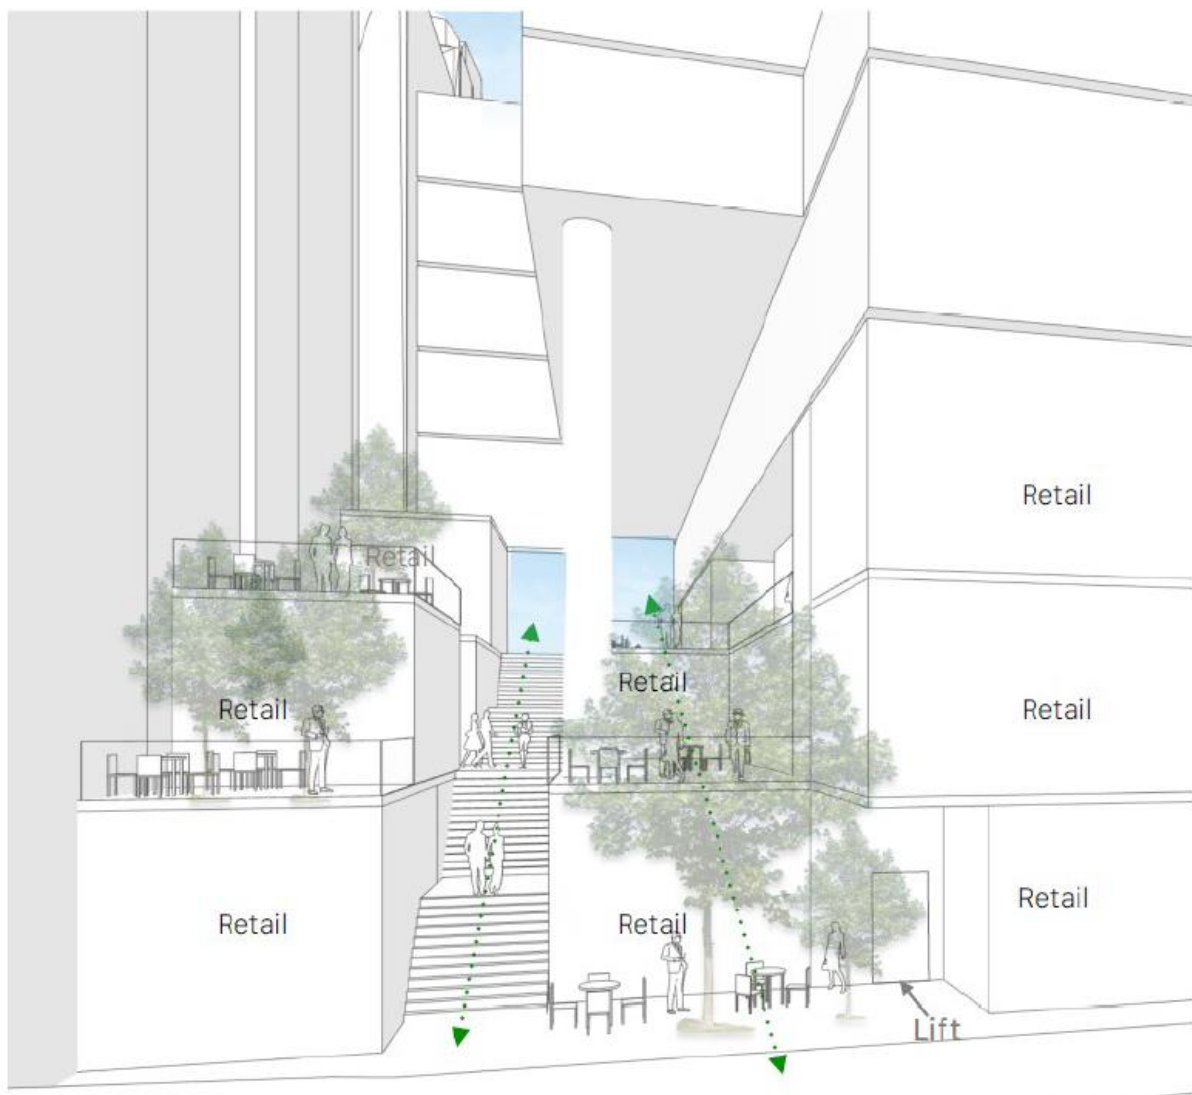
Indicative design of pedestrian through-site link - Sussex Street elevation
